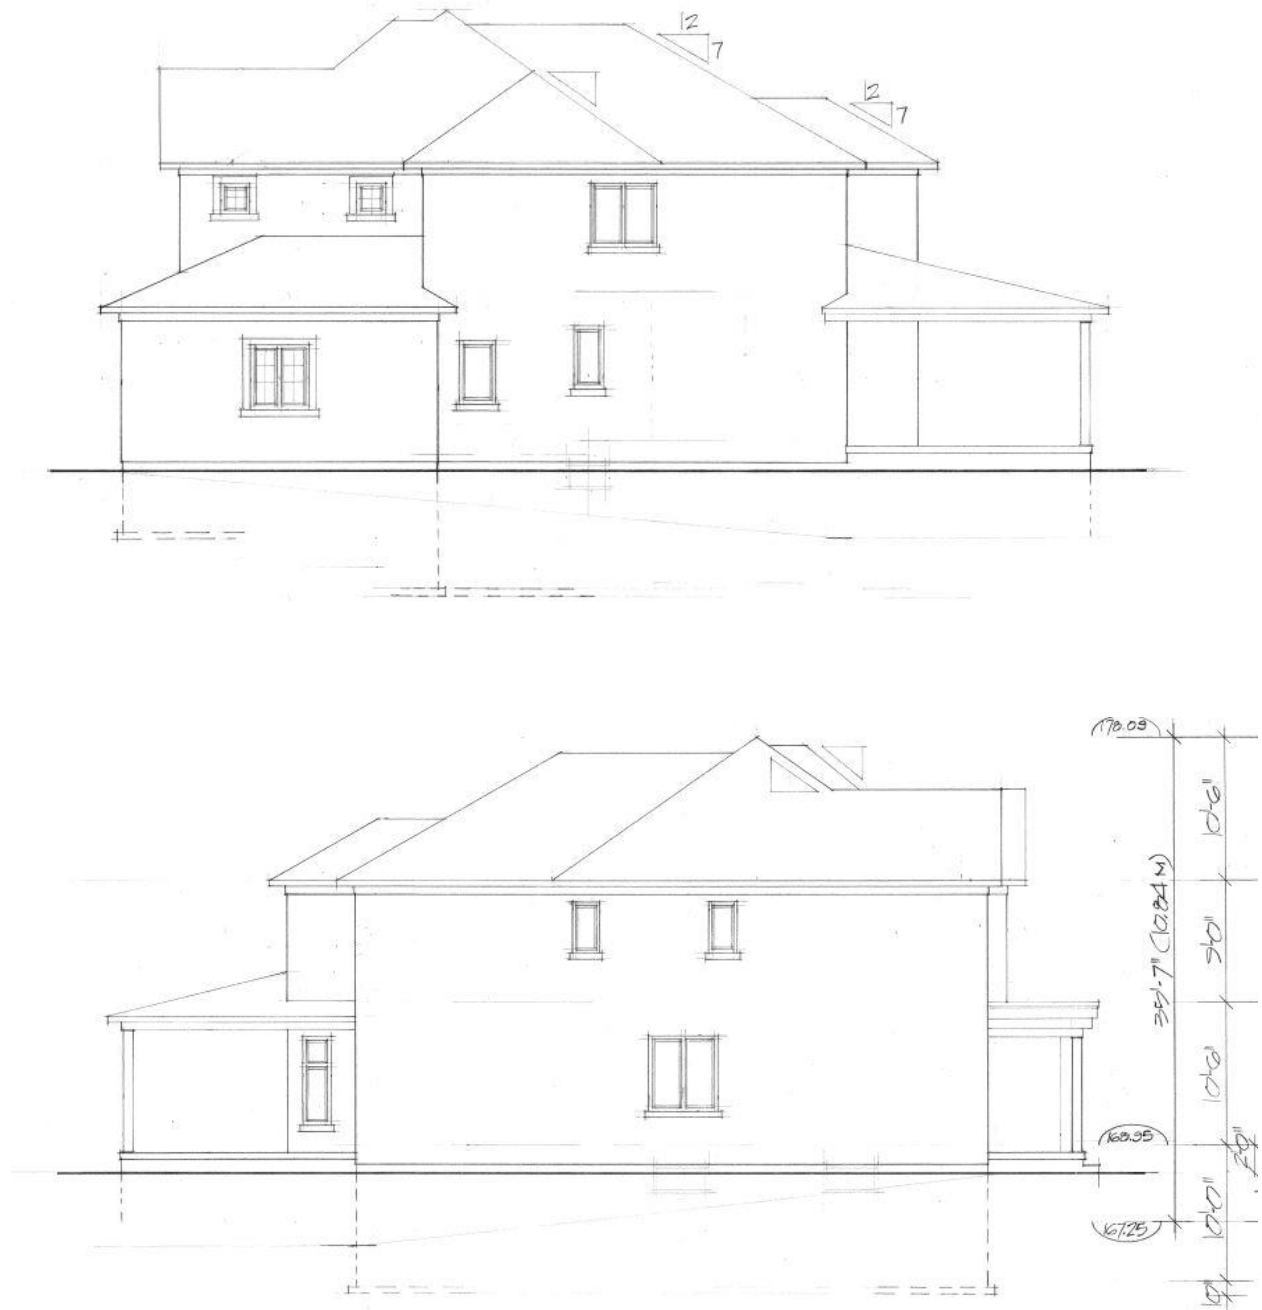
Proposed north (above) and south (below) elevations of the new dwelling.
